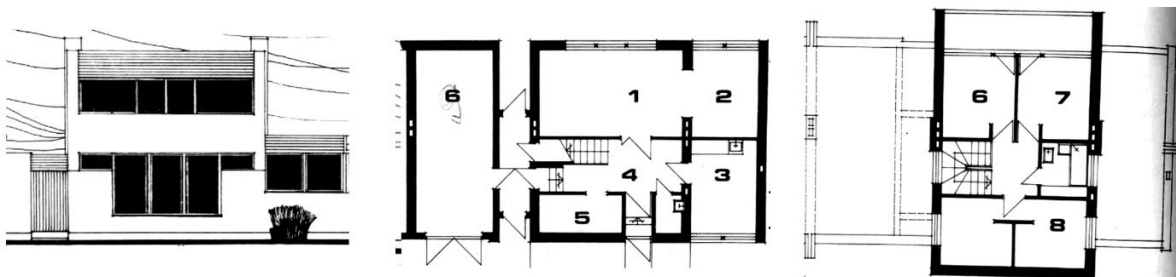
Project 100-74, an example of a partly two-floored dwelling from 1976 (left to right: elevation; ground floor; upper floor) (Berends & Dobrůš, 1976)
